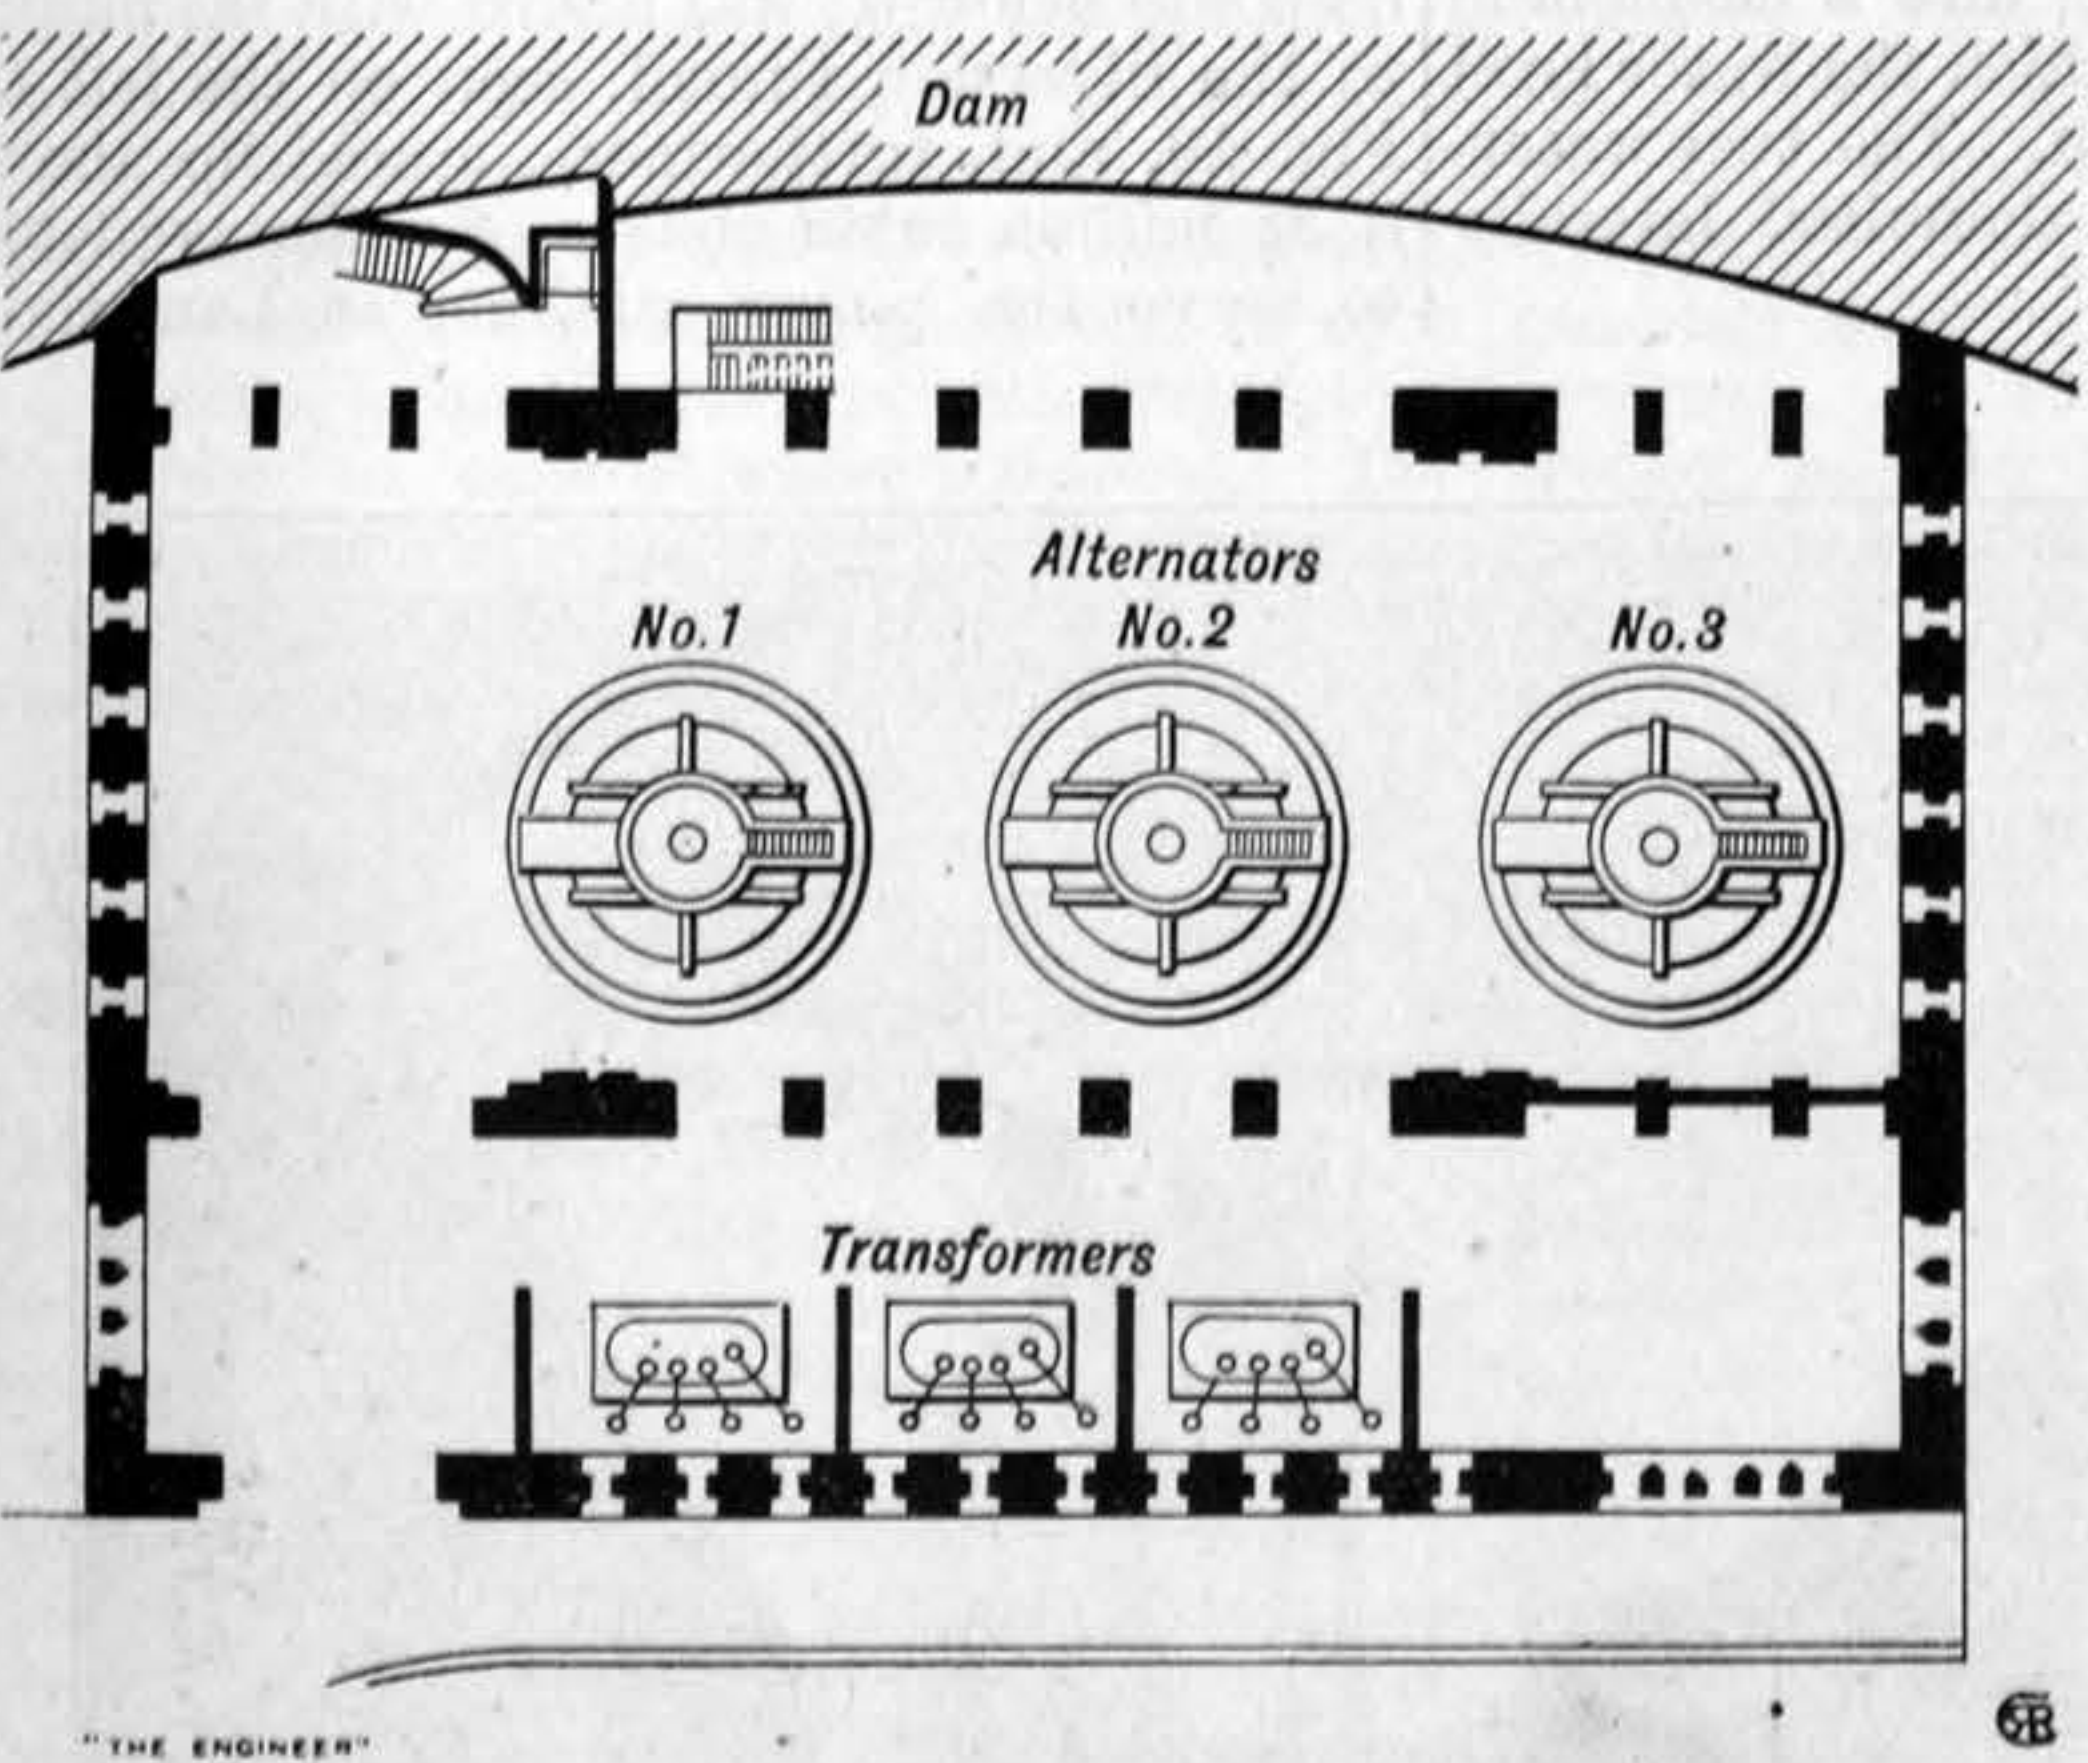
AND 6—PLAN AND SECTION OF ST. ETIENNE-CANTALES DAM
